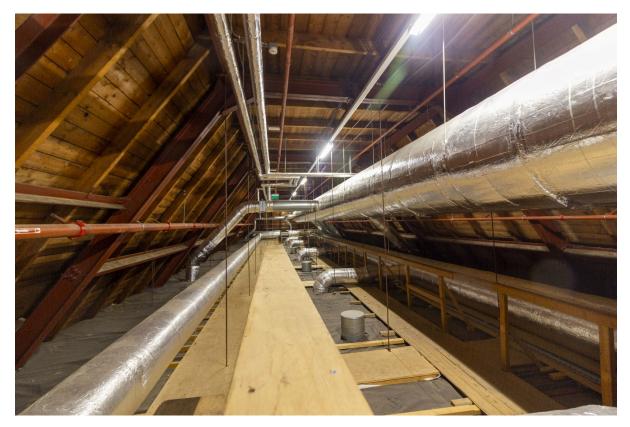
Building 22 roof: steel beams and wood support structure [photo: Michiel Fremouw]
